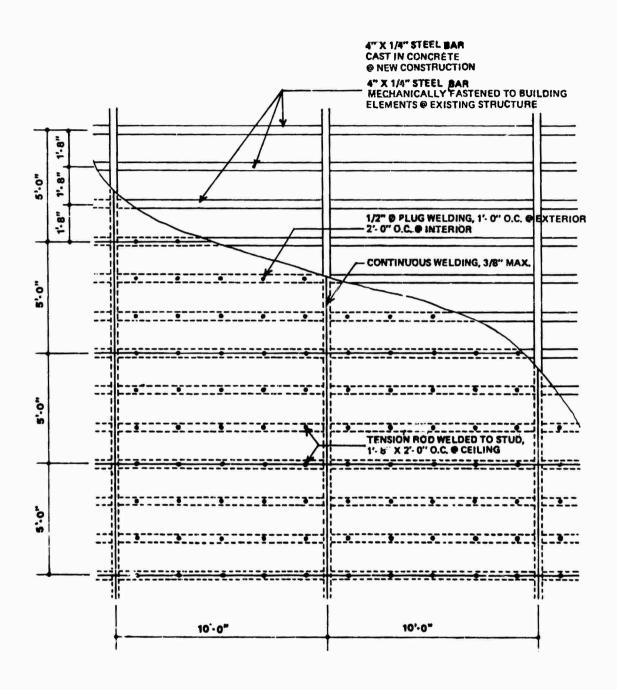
TYPICAL SHIELDING PLAN FOR FLOOR AND CEILING
